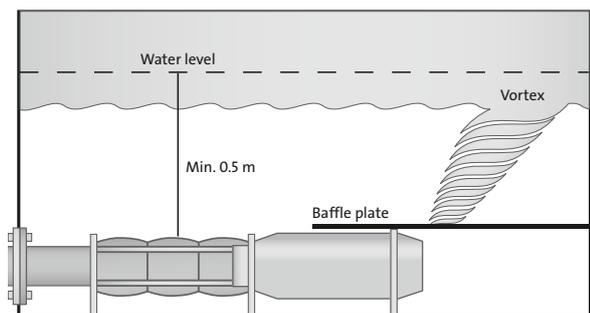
Vortex baffle plate on horizontally installed pump (cross-section)
